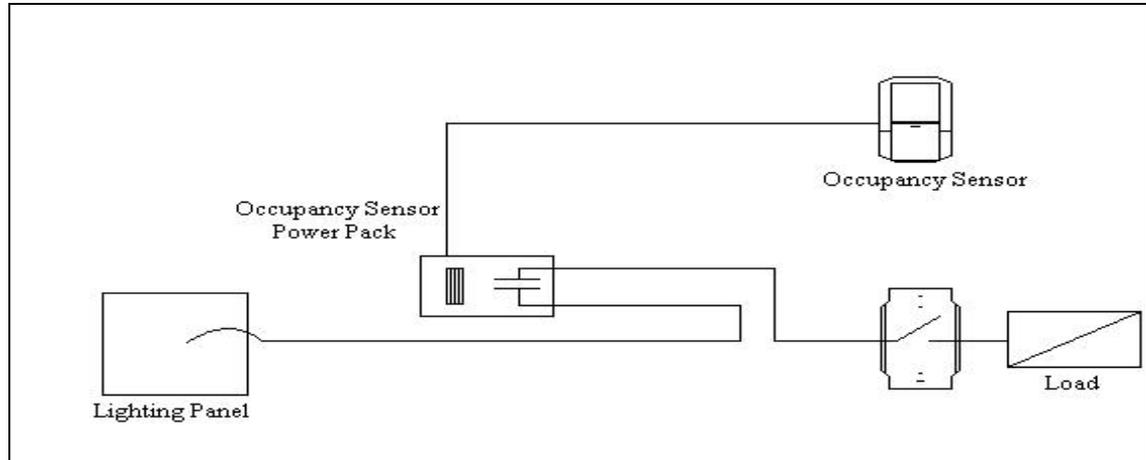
Electrically Held, Normally Open, Latching Wall Switch With Occupancy Sensor
